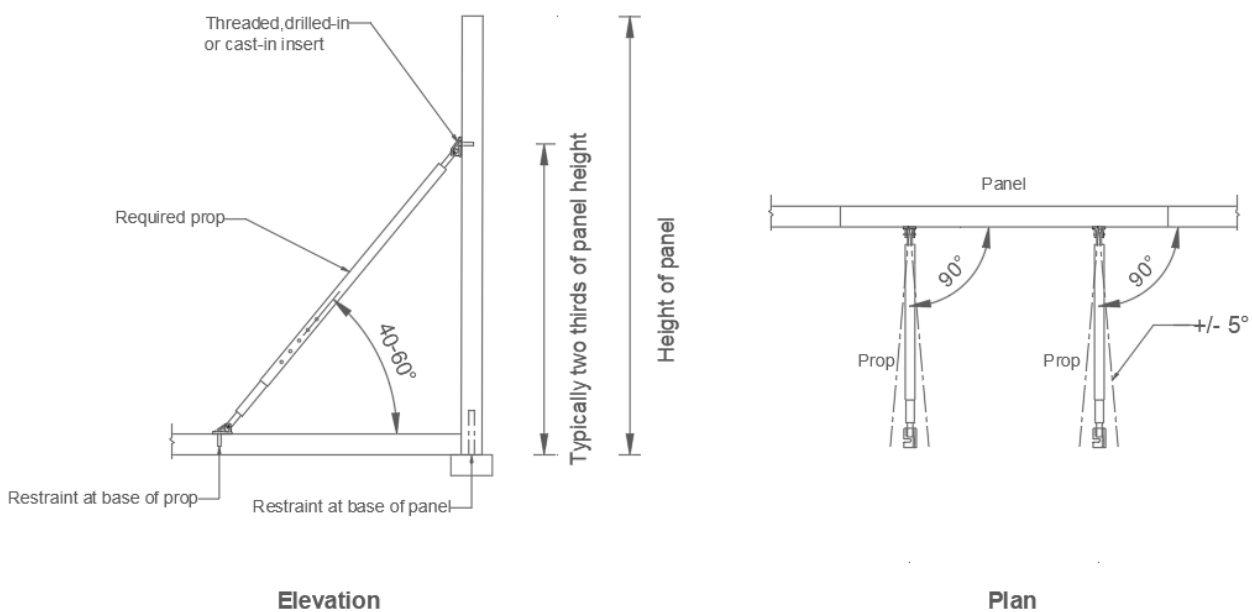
Recommended concrete panel bracing- elevation (left) and plan (right).
